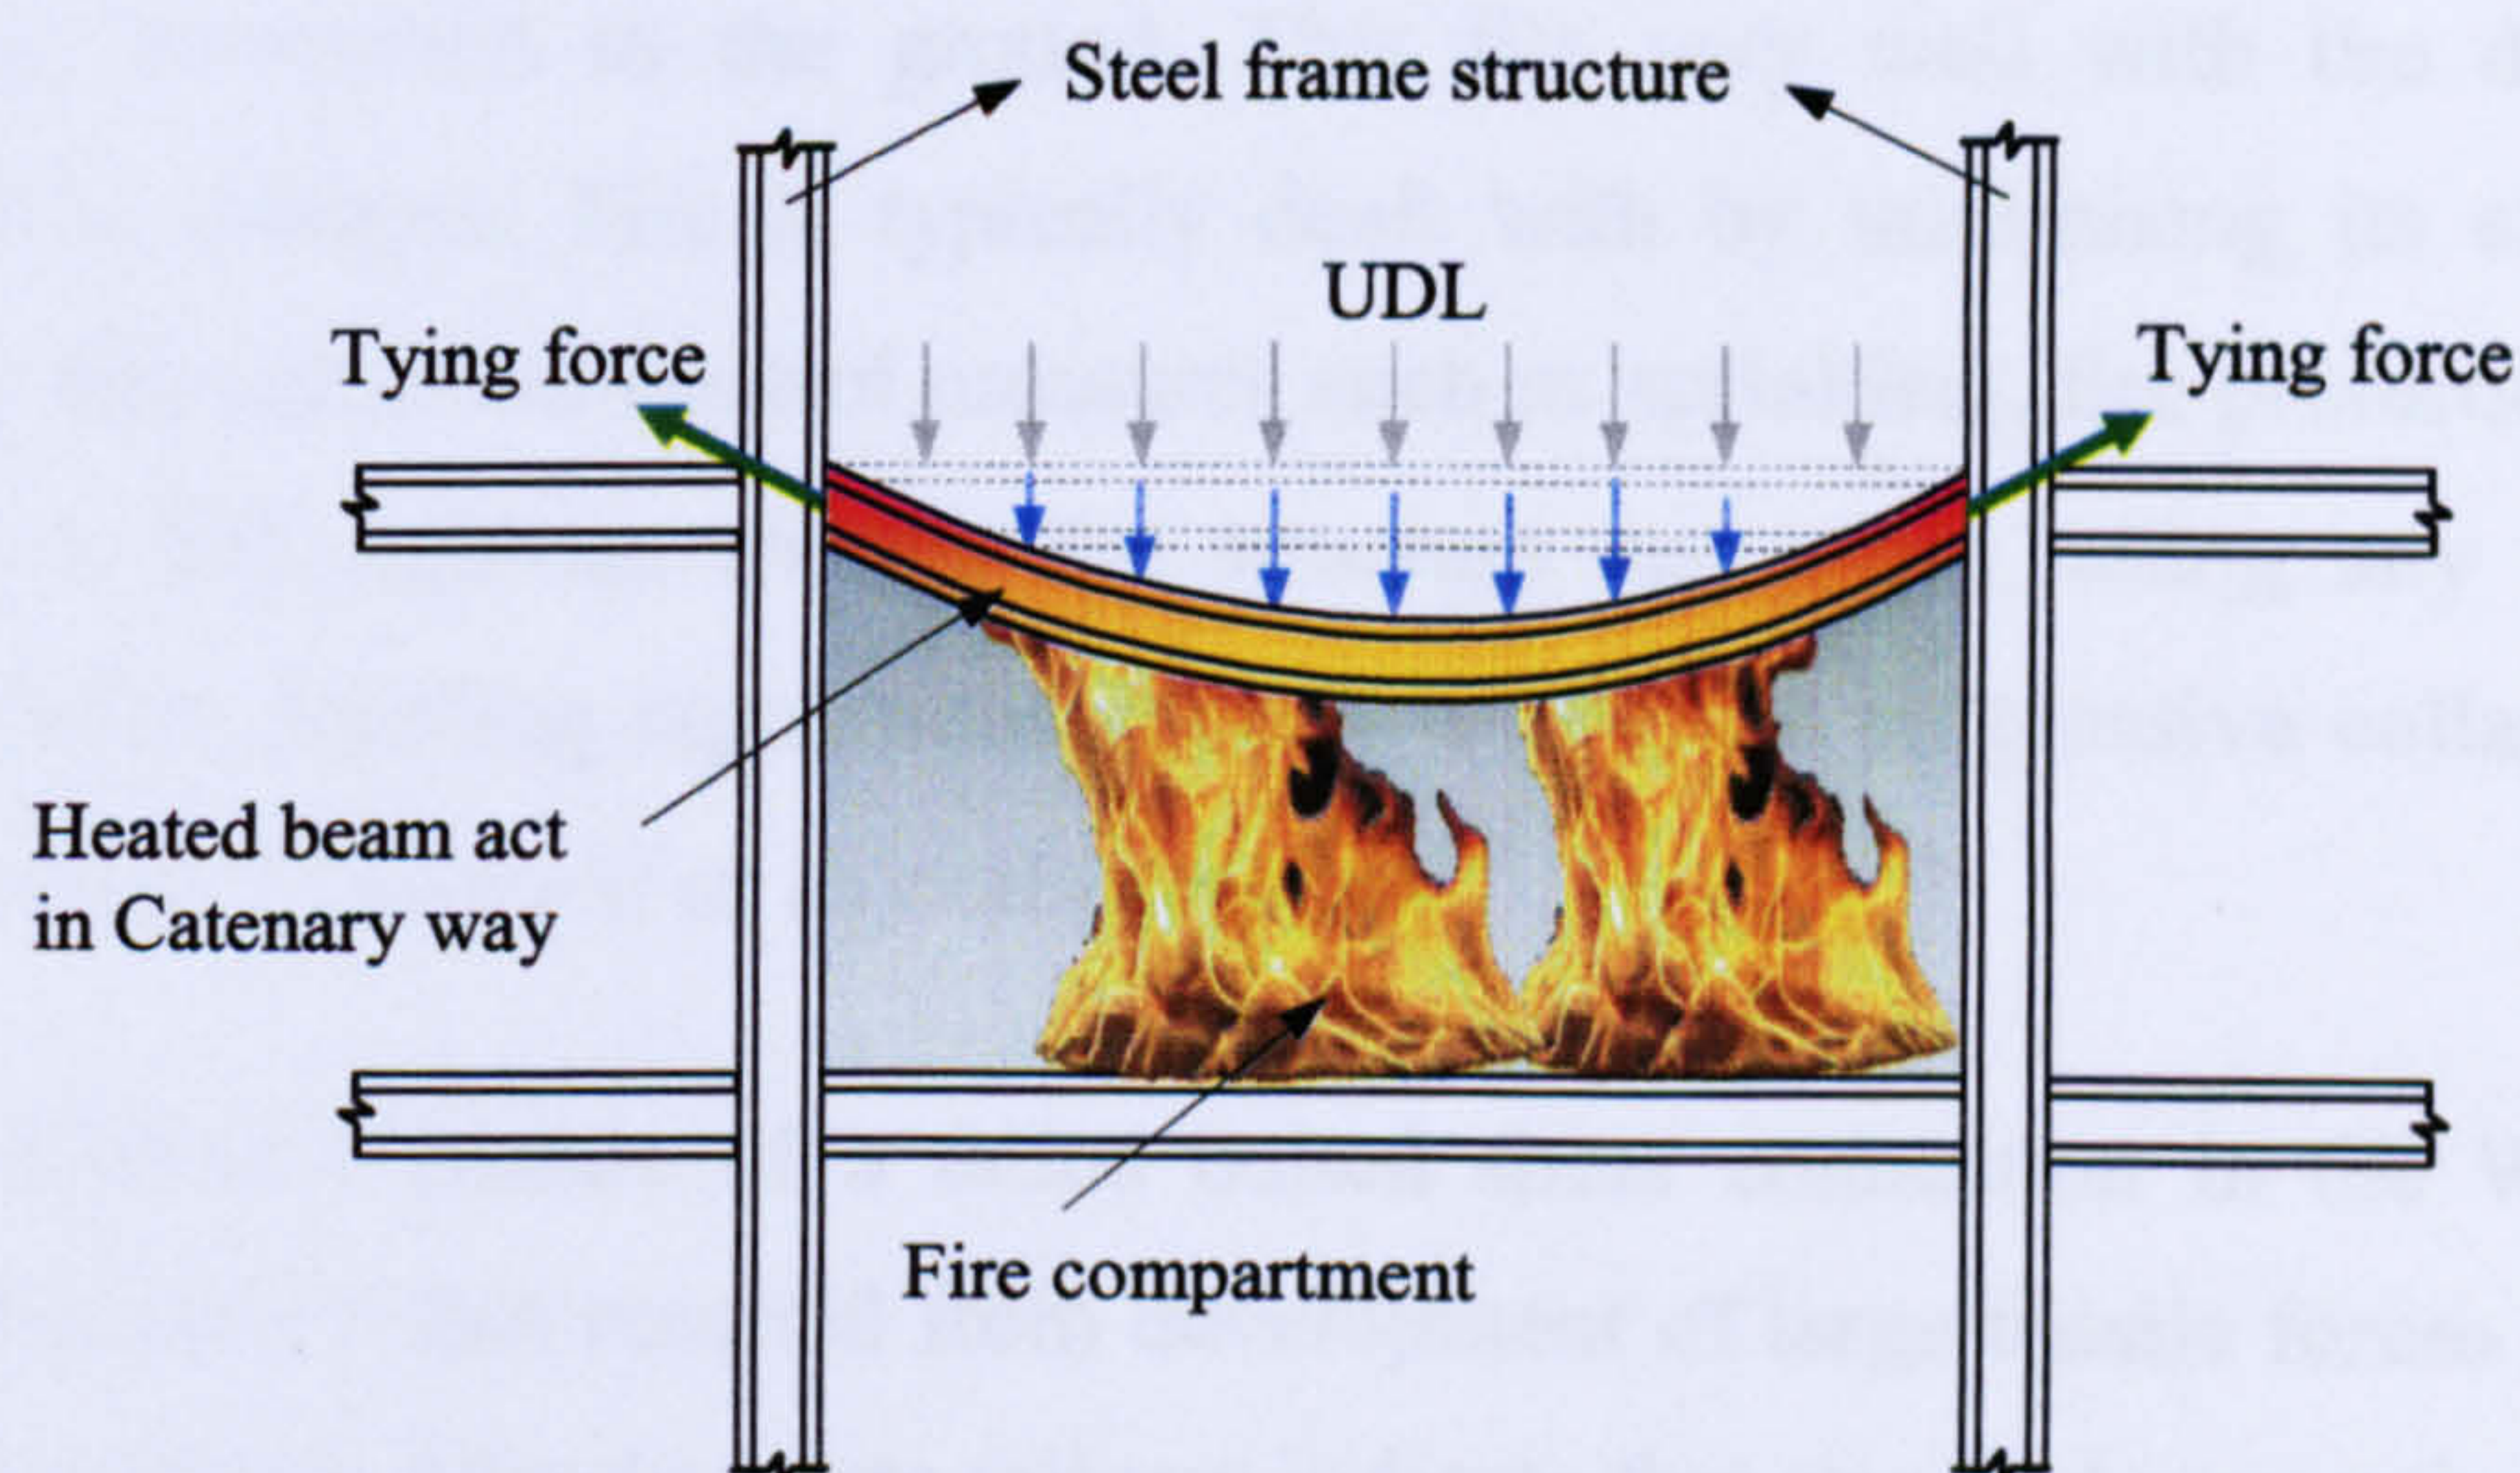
Steel beam under fire acting as a suspension cable in catenary way
